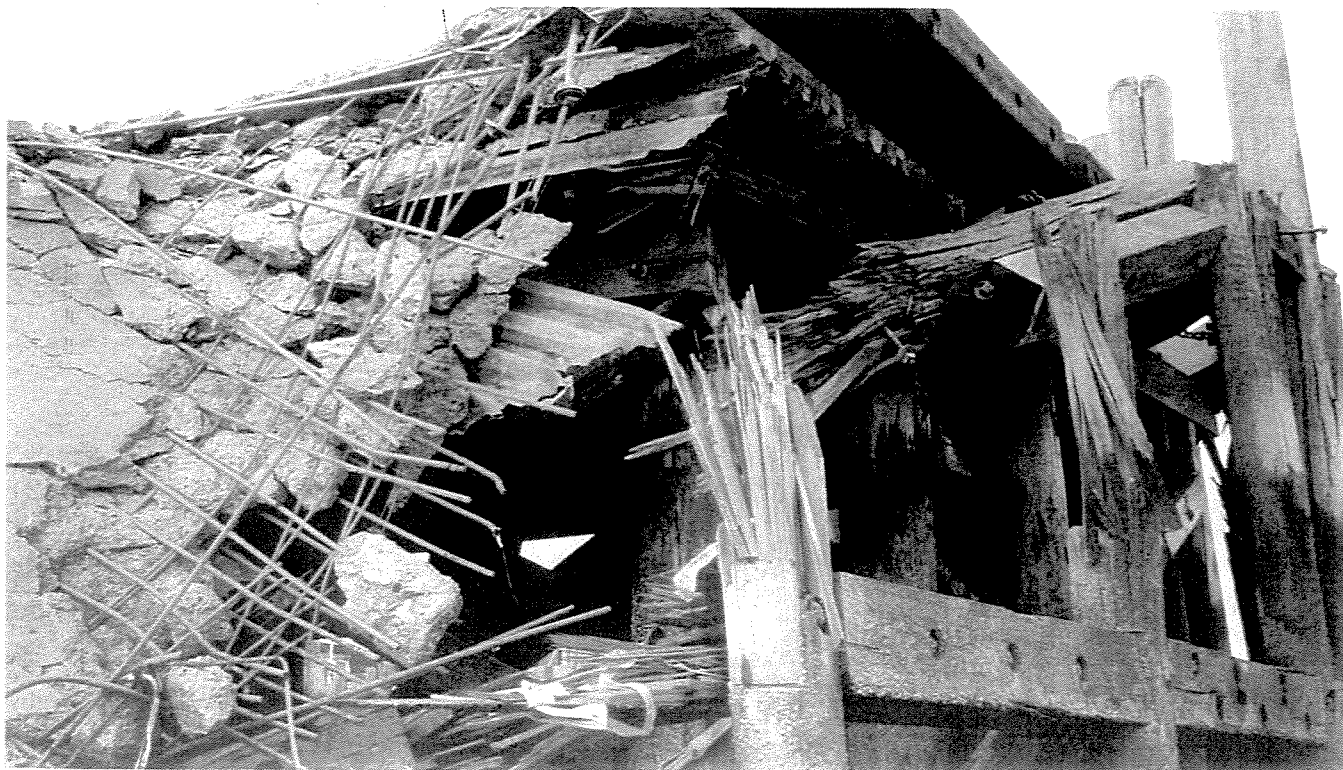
East end of pier close-up view collapsed/erect interface, 20' south of the NE corner, looking NW.
